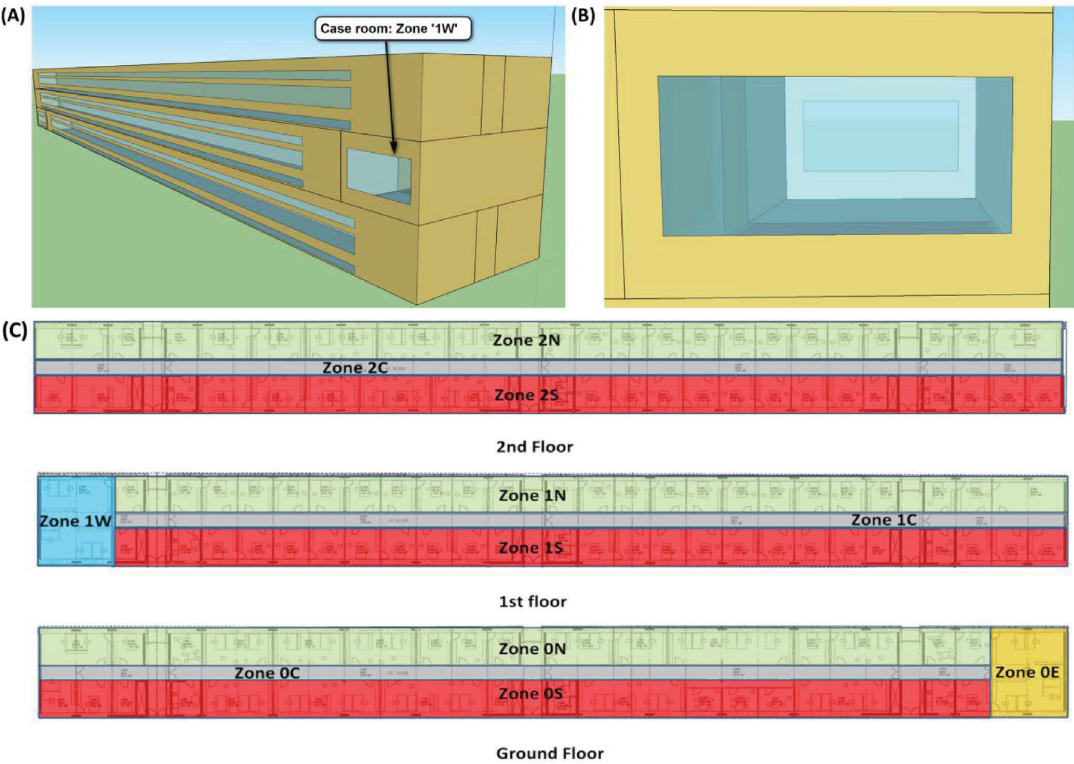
(A)(B) View of the building and case room, (C) layout of the case office building.
